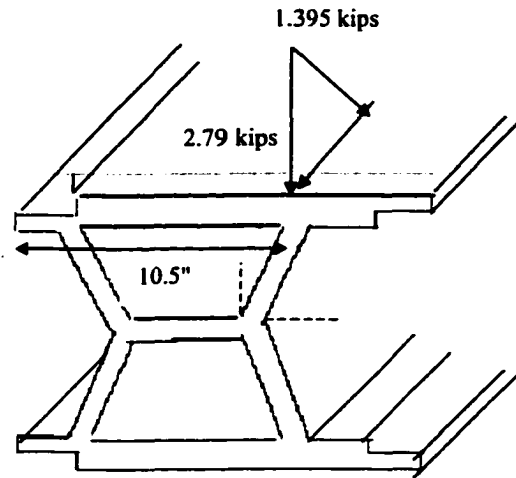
Patch load on FRP Bridge Deck Component
